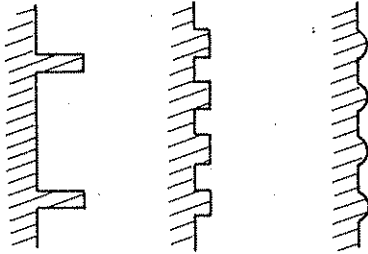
Rockfill dam with earth core. Unreasonable design of the interface core/structure.
